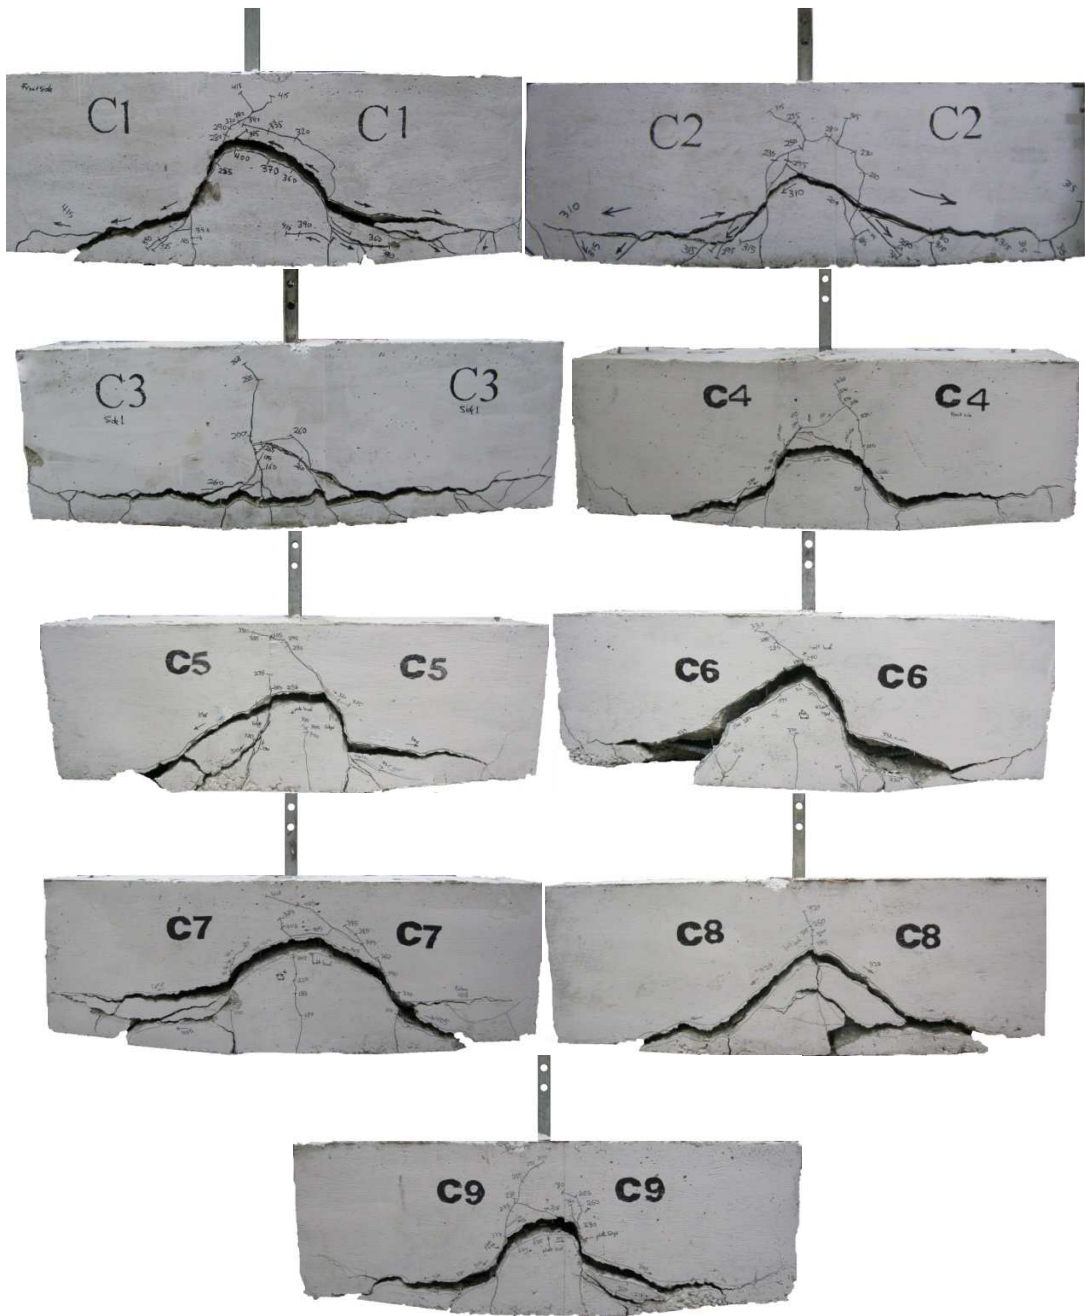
5 Crack patterns of tested beams under monotonic compression loading
